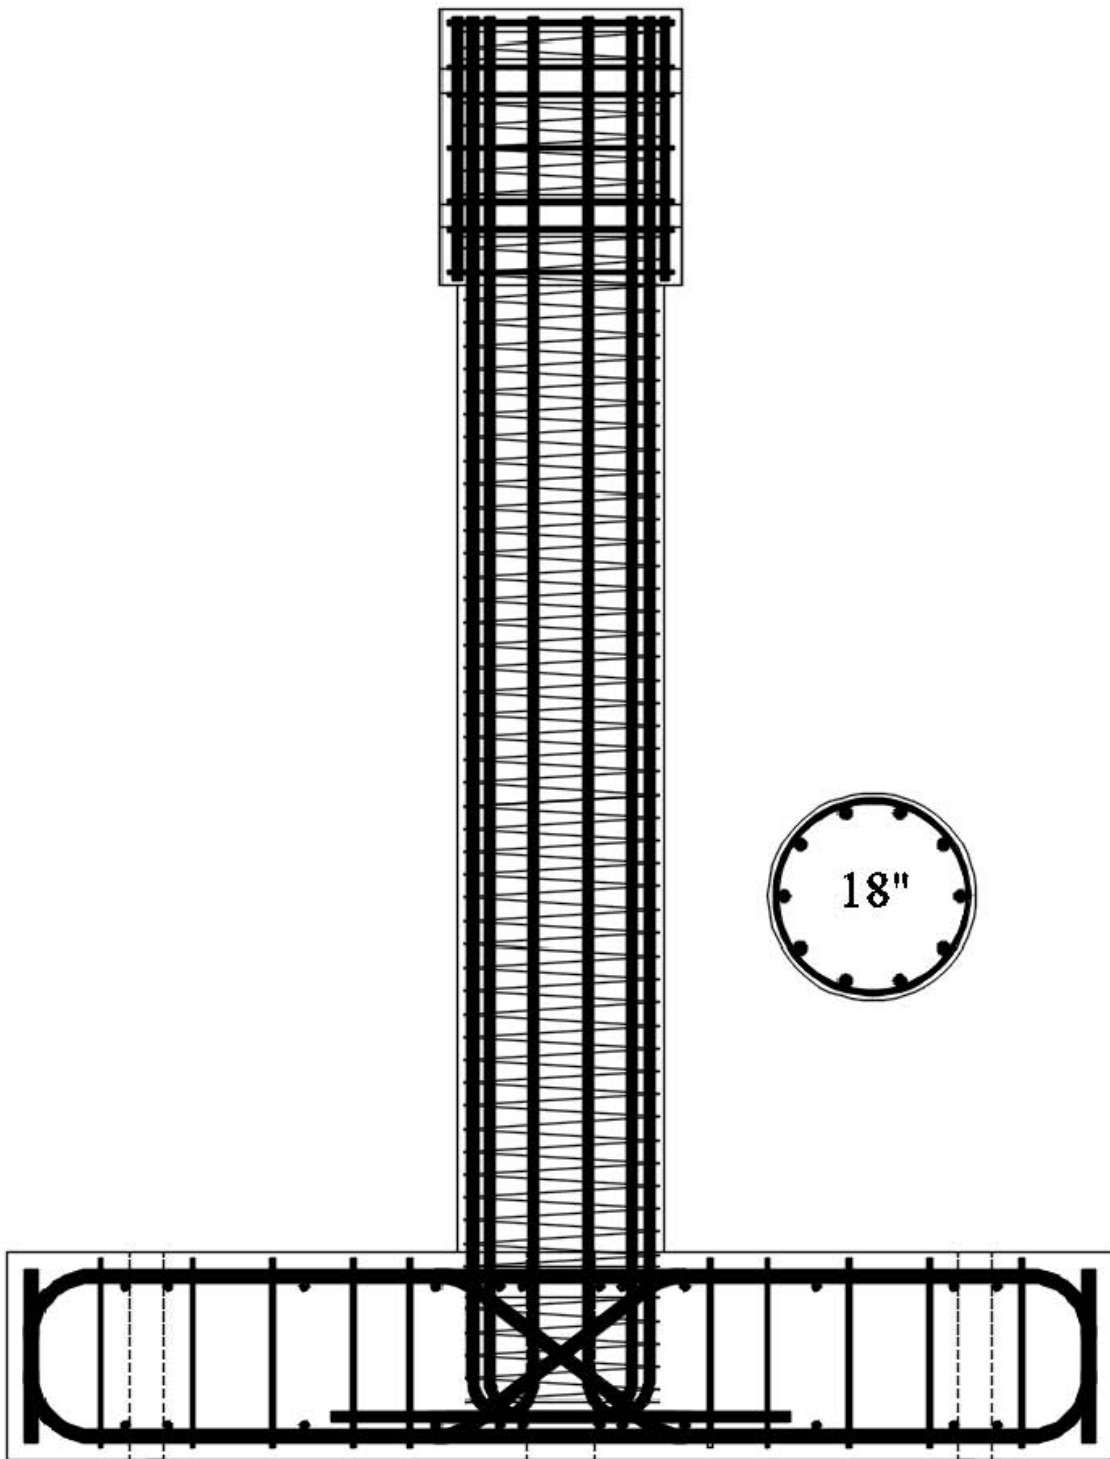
General Reinforcement Details for 18" Diameter Specimens
